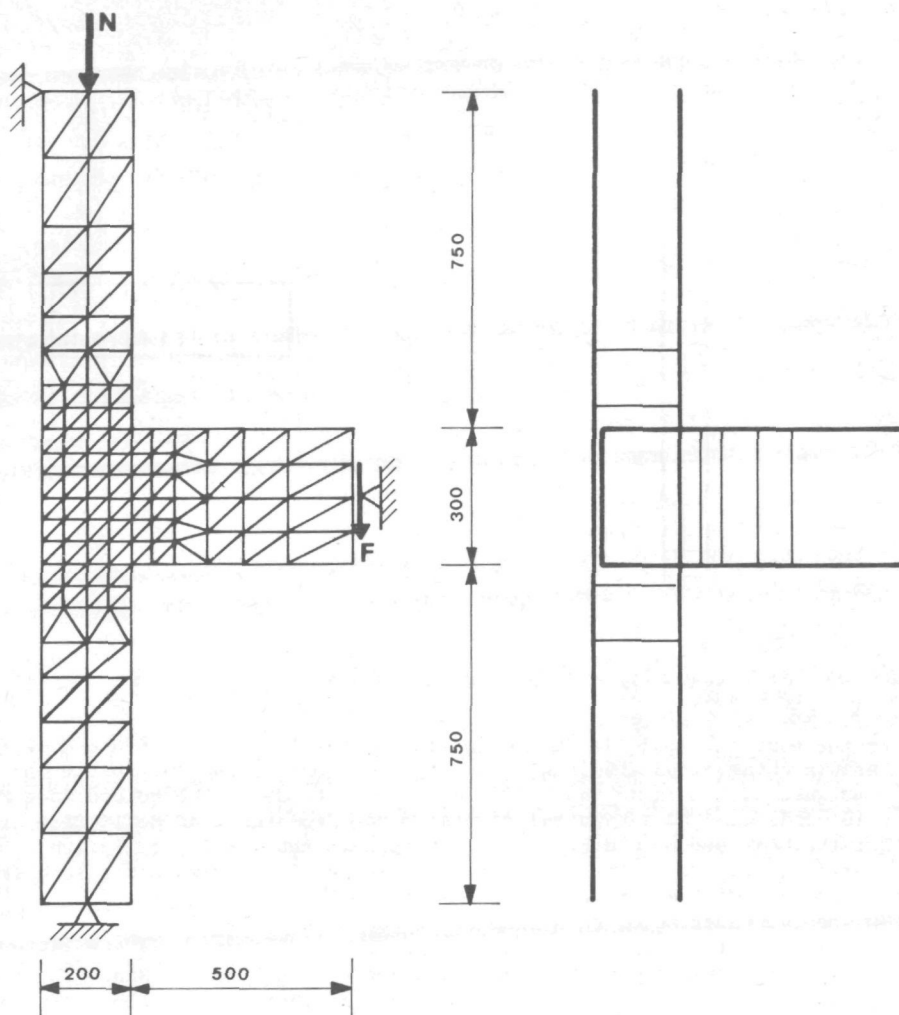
Reinforcement of beam and column in the specimen
